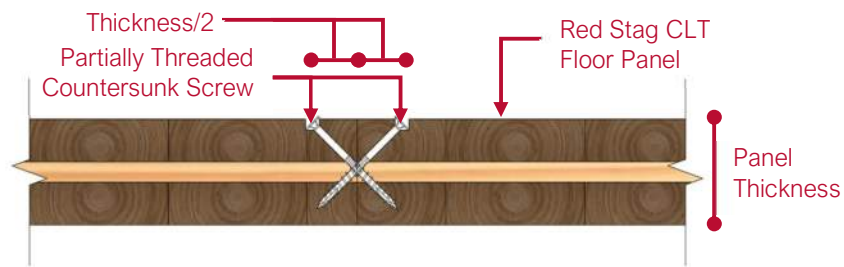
Red Stag three (3) layer CLT floor to floor butt joint connection.
